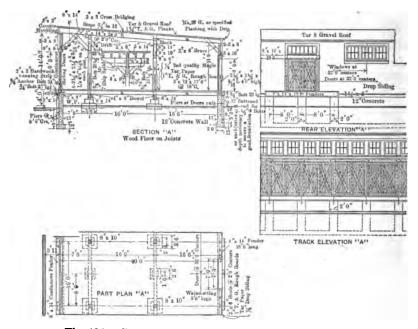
C. P. R. 40-ft. Freight Shed without Platform.
